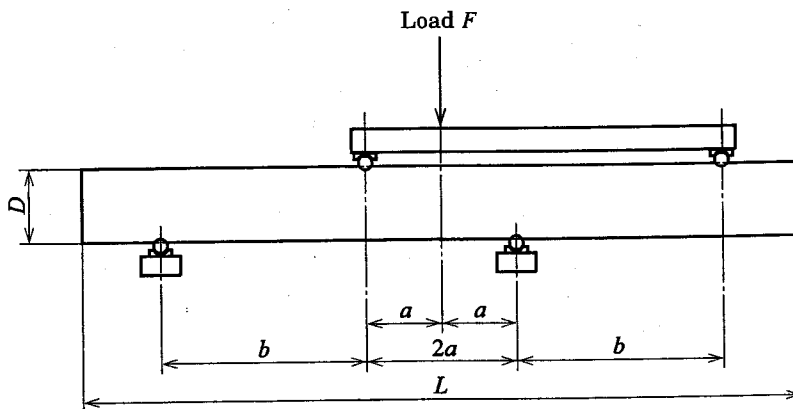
Shearing strength test method of piles (loading on beam with one end overhanging)
